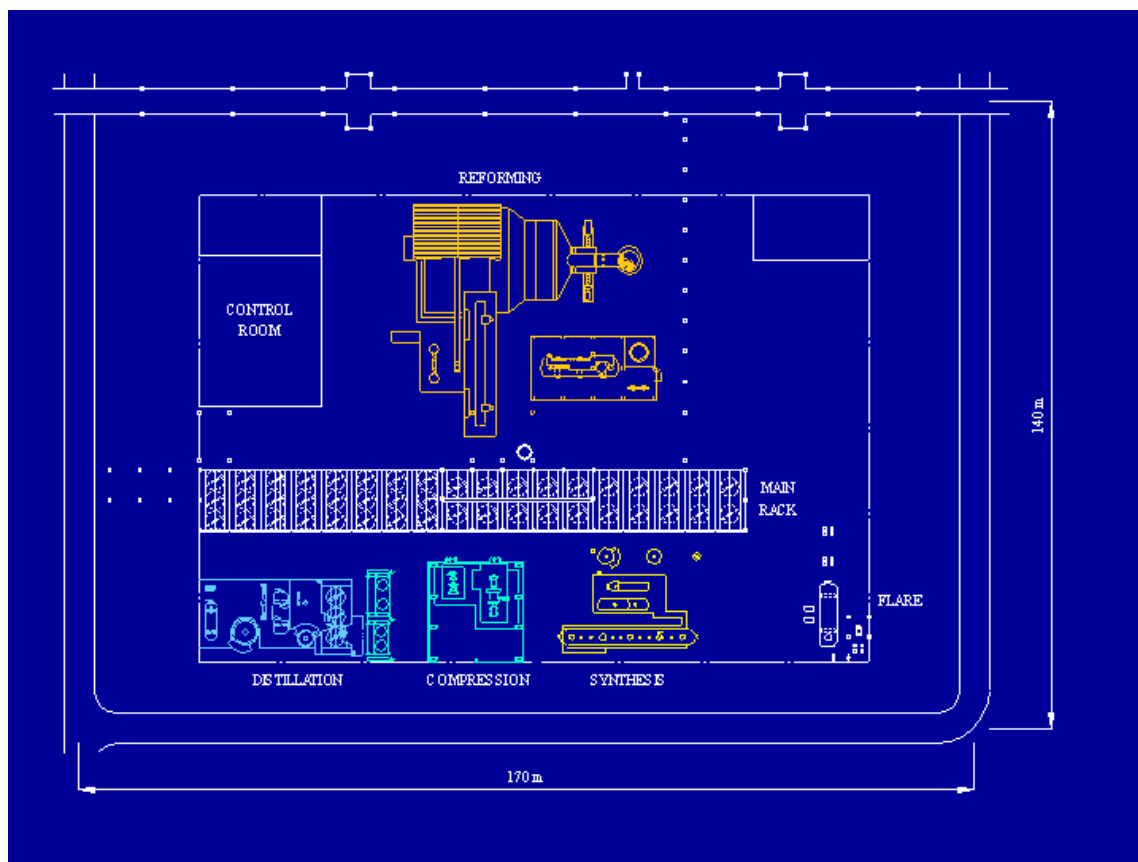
Simplified Plant Layout of New Methanol Plant
